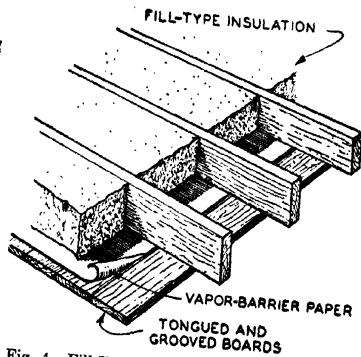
Fill-Type Insulation Applied between Ceiling Joists over Vapor Barrier
